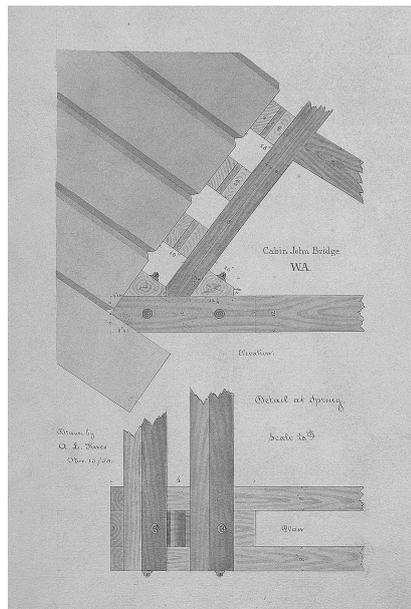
Centering detail showing wedges for striking (from WA Office drawing)
